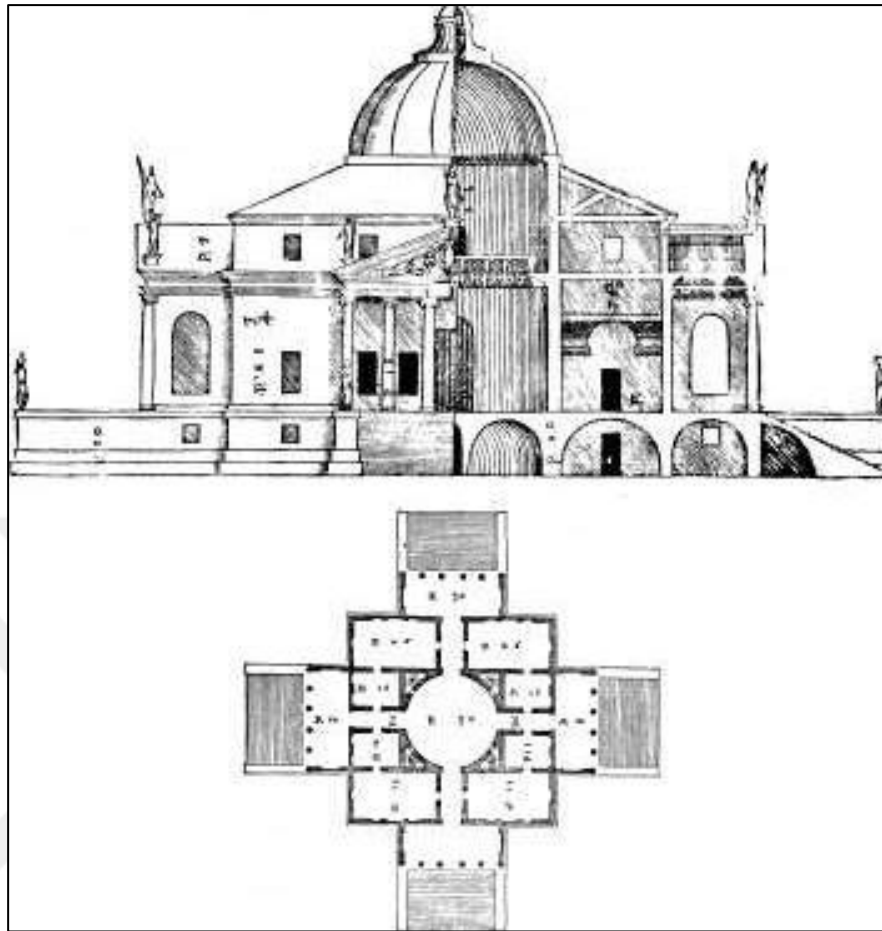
Andrea Palladio, section and ground plan of the Villa Rotonda (formerly Villa Capra). Vicenza, Italy, 1566-1590s [40].
